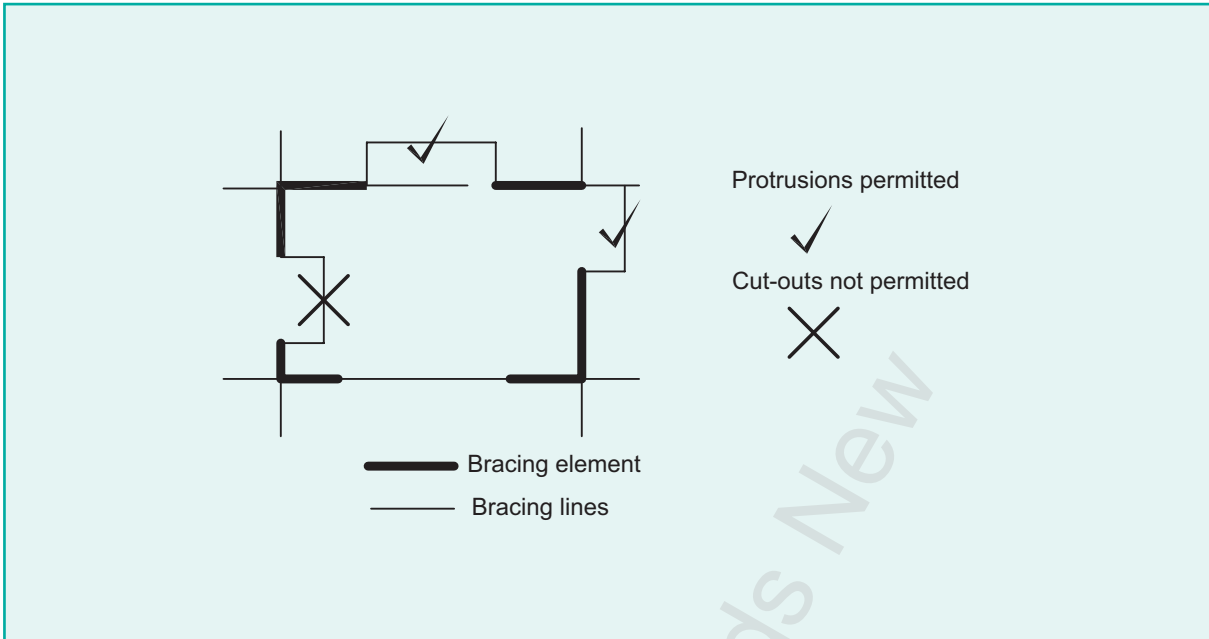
(a) – Ceiling diaphragm protrusions and cut-outs (see 13.5.1(b))
